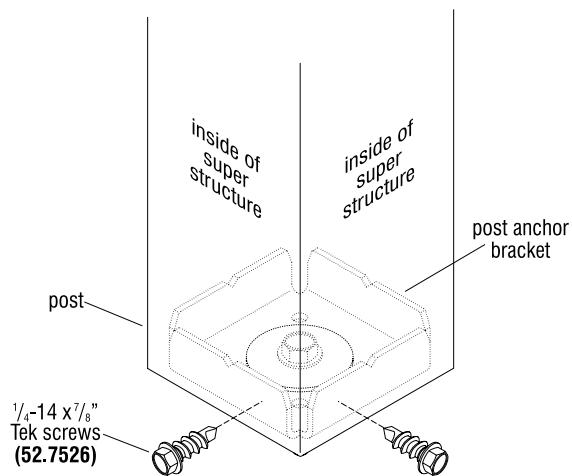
Detail C - Super Structure Post - Carpet or Steel Stud Floor Anchor Specifications
